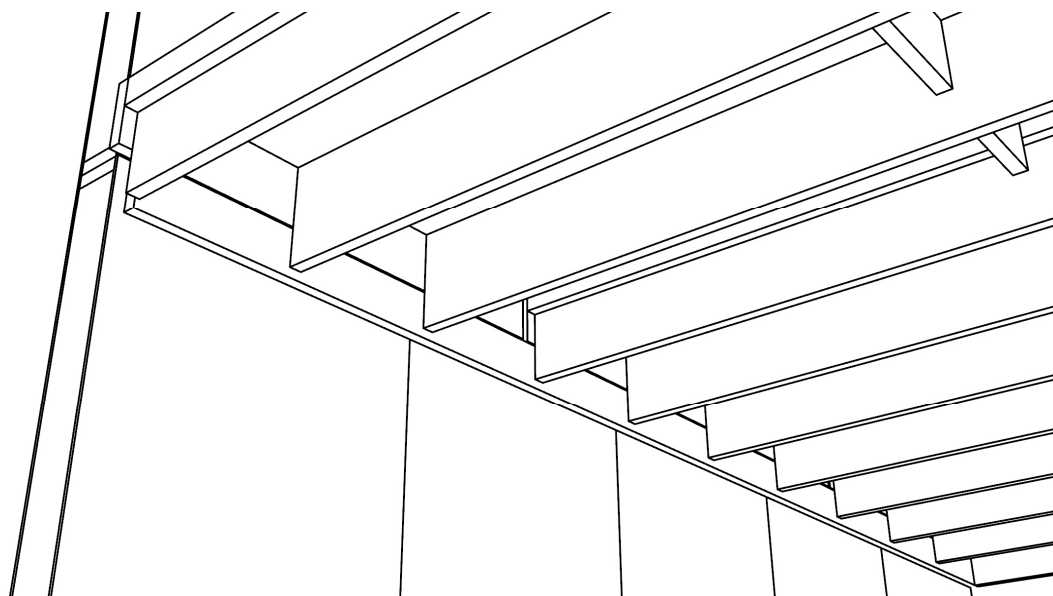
Displaying support for beams that constitutes the floors load bearing structure.
